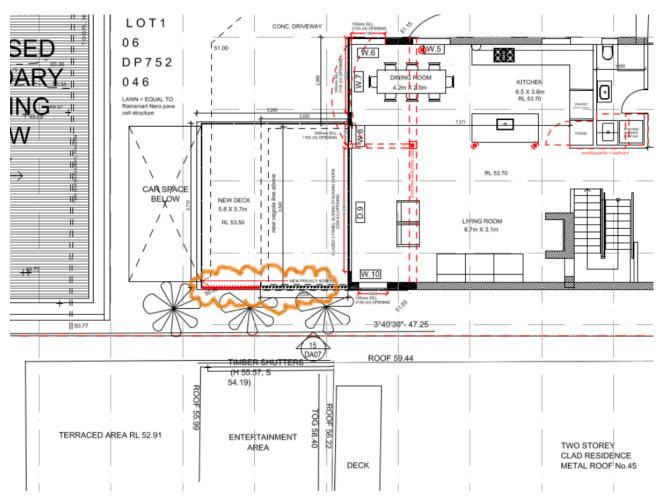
Extract from submitted s4.55(IA) Modification Plans – Level 2 Floorplan with subject amendment highlighted and detailing greater rear alignment of adjoining property to the east.
